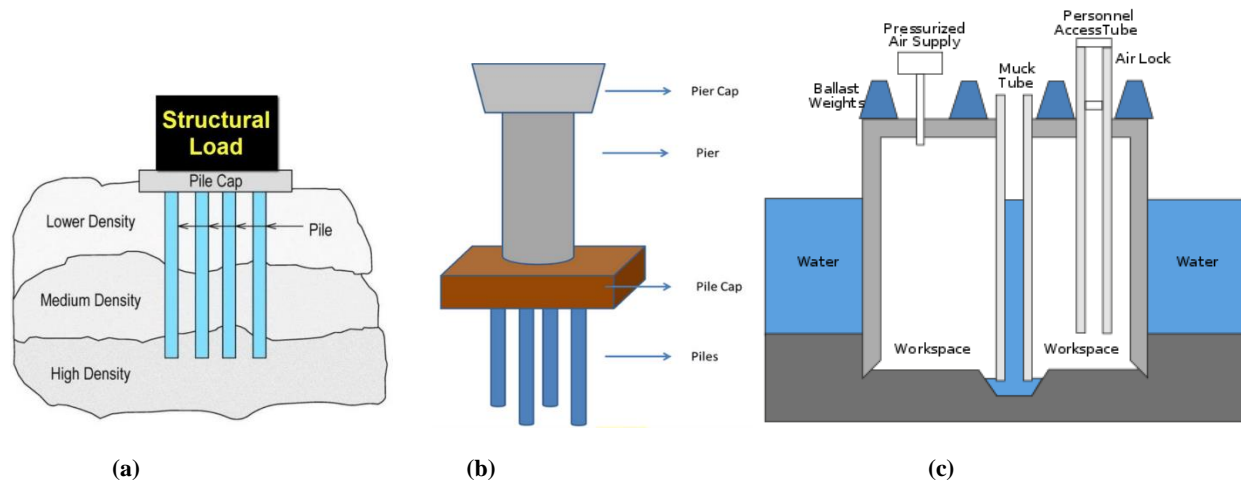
(a) Pile Foundation (b) Pier foundation (c) Caisson foundation
